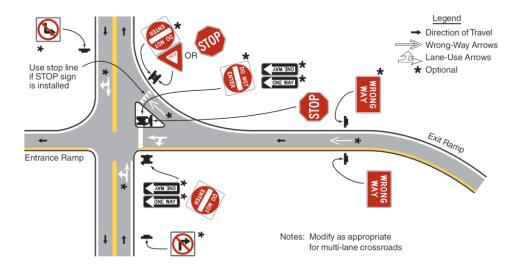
Example application of regulatory signage and pavement markings at an exit ramp termination to deter wrong-way entry. (Source: TxDOT 2014).
